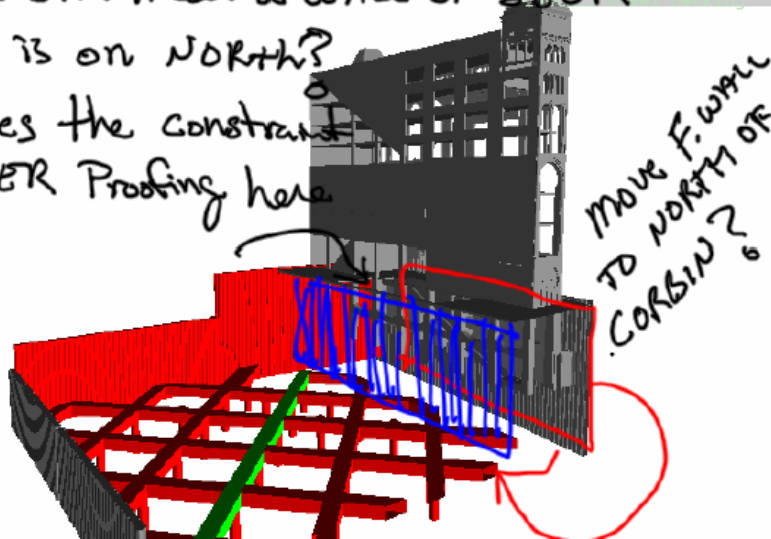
This 4D model helped the CCM team to decide that it would be beneficial during construction to move a water retention wall from the south side of a building to the north side. The CCM team hoped that this decision would ease the later construction activities, as the work on the building and the work in the excavation pit would thereby be decoupled.
